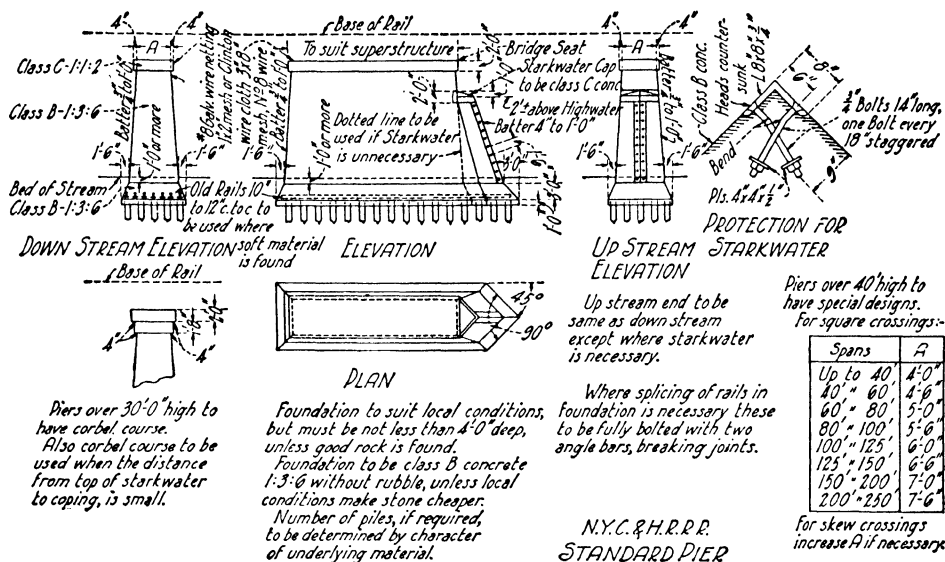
MASONRY PIERS, N. Y. C. & H. R. R. R.
